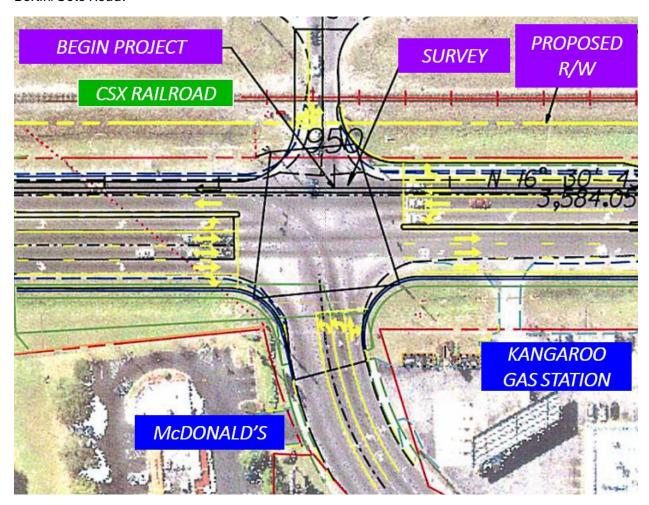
PD&E Concept at US 17/New Berlin Road/Cole Road
